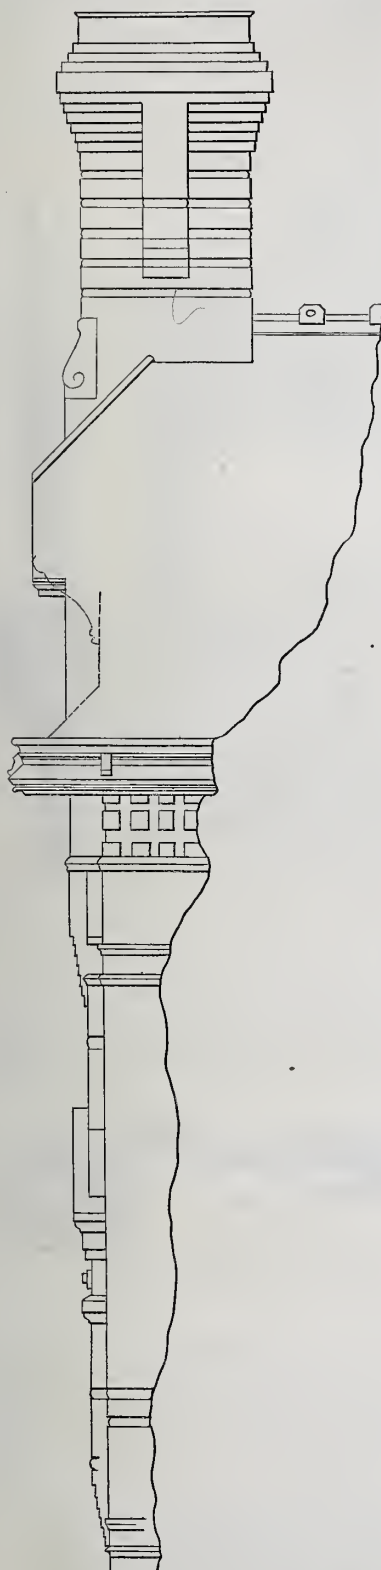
Front Elevation of South Gable and Chimney.—Scale, $\frac{1}{4}$ Inch to the Foot.
